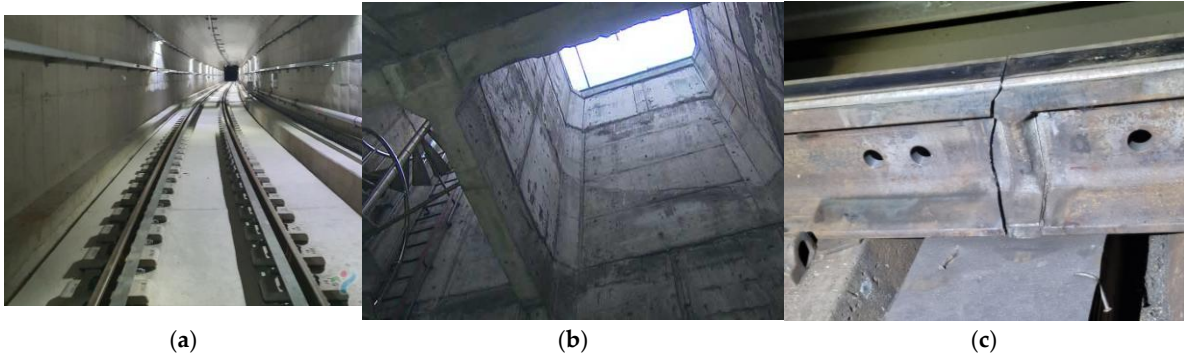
Installation status of subway CWR: (a) rail continuous welding; (b) area around underground ventilation shafts; (c) CWR weld fracture.
